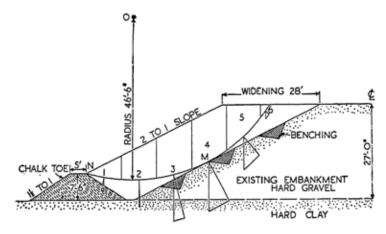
Embankment Widening with Chalk Toe. (Problem 47.)
